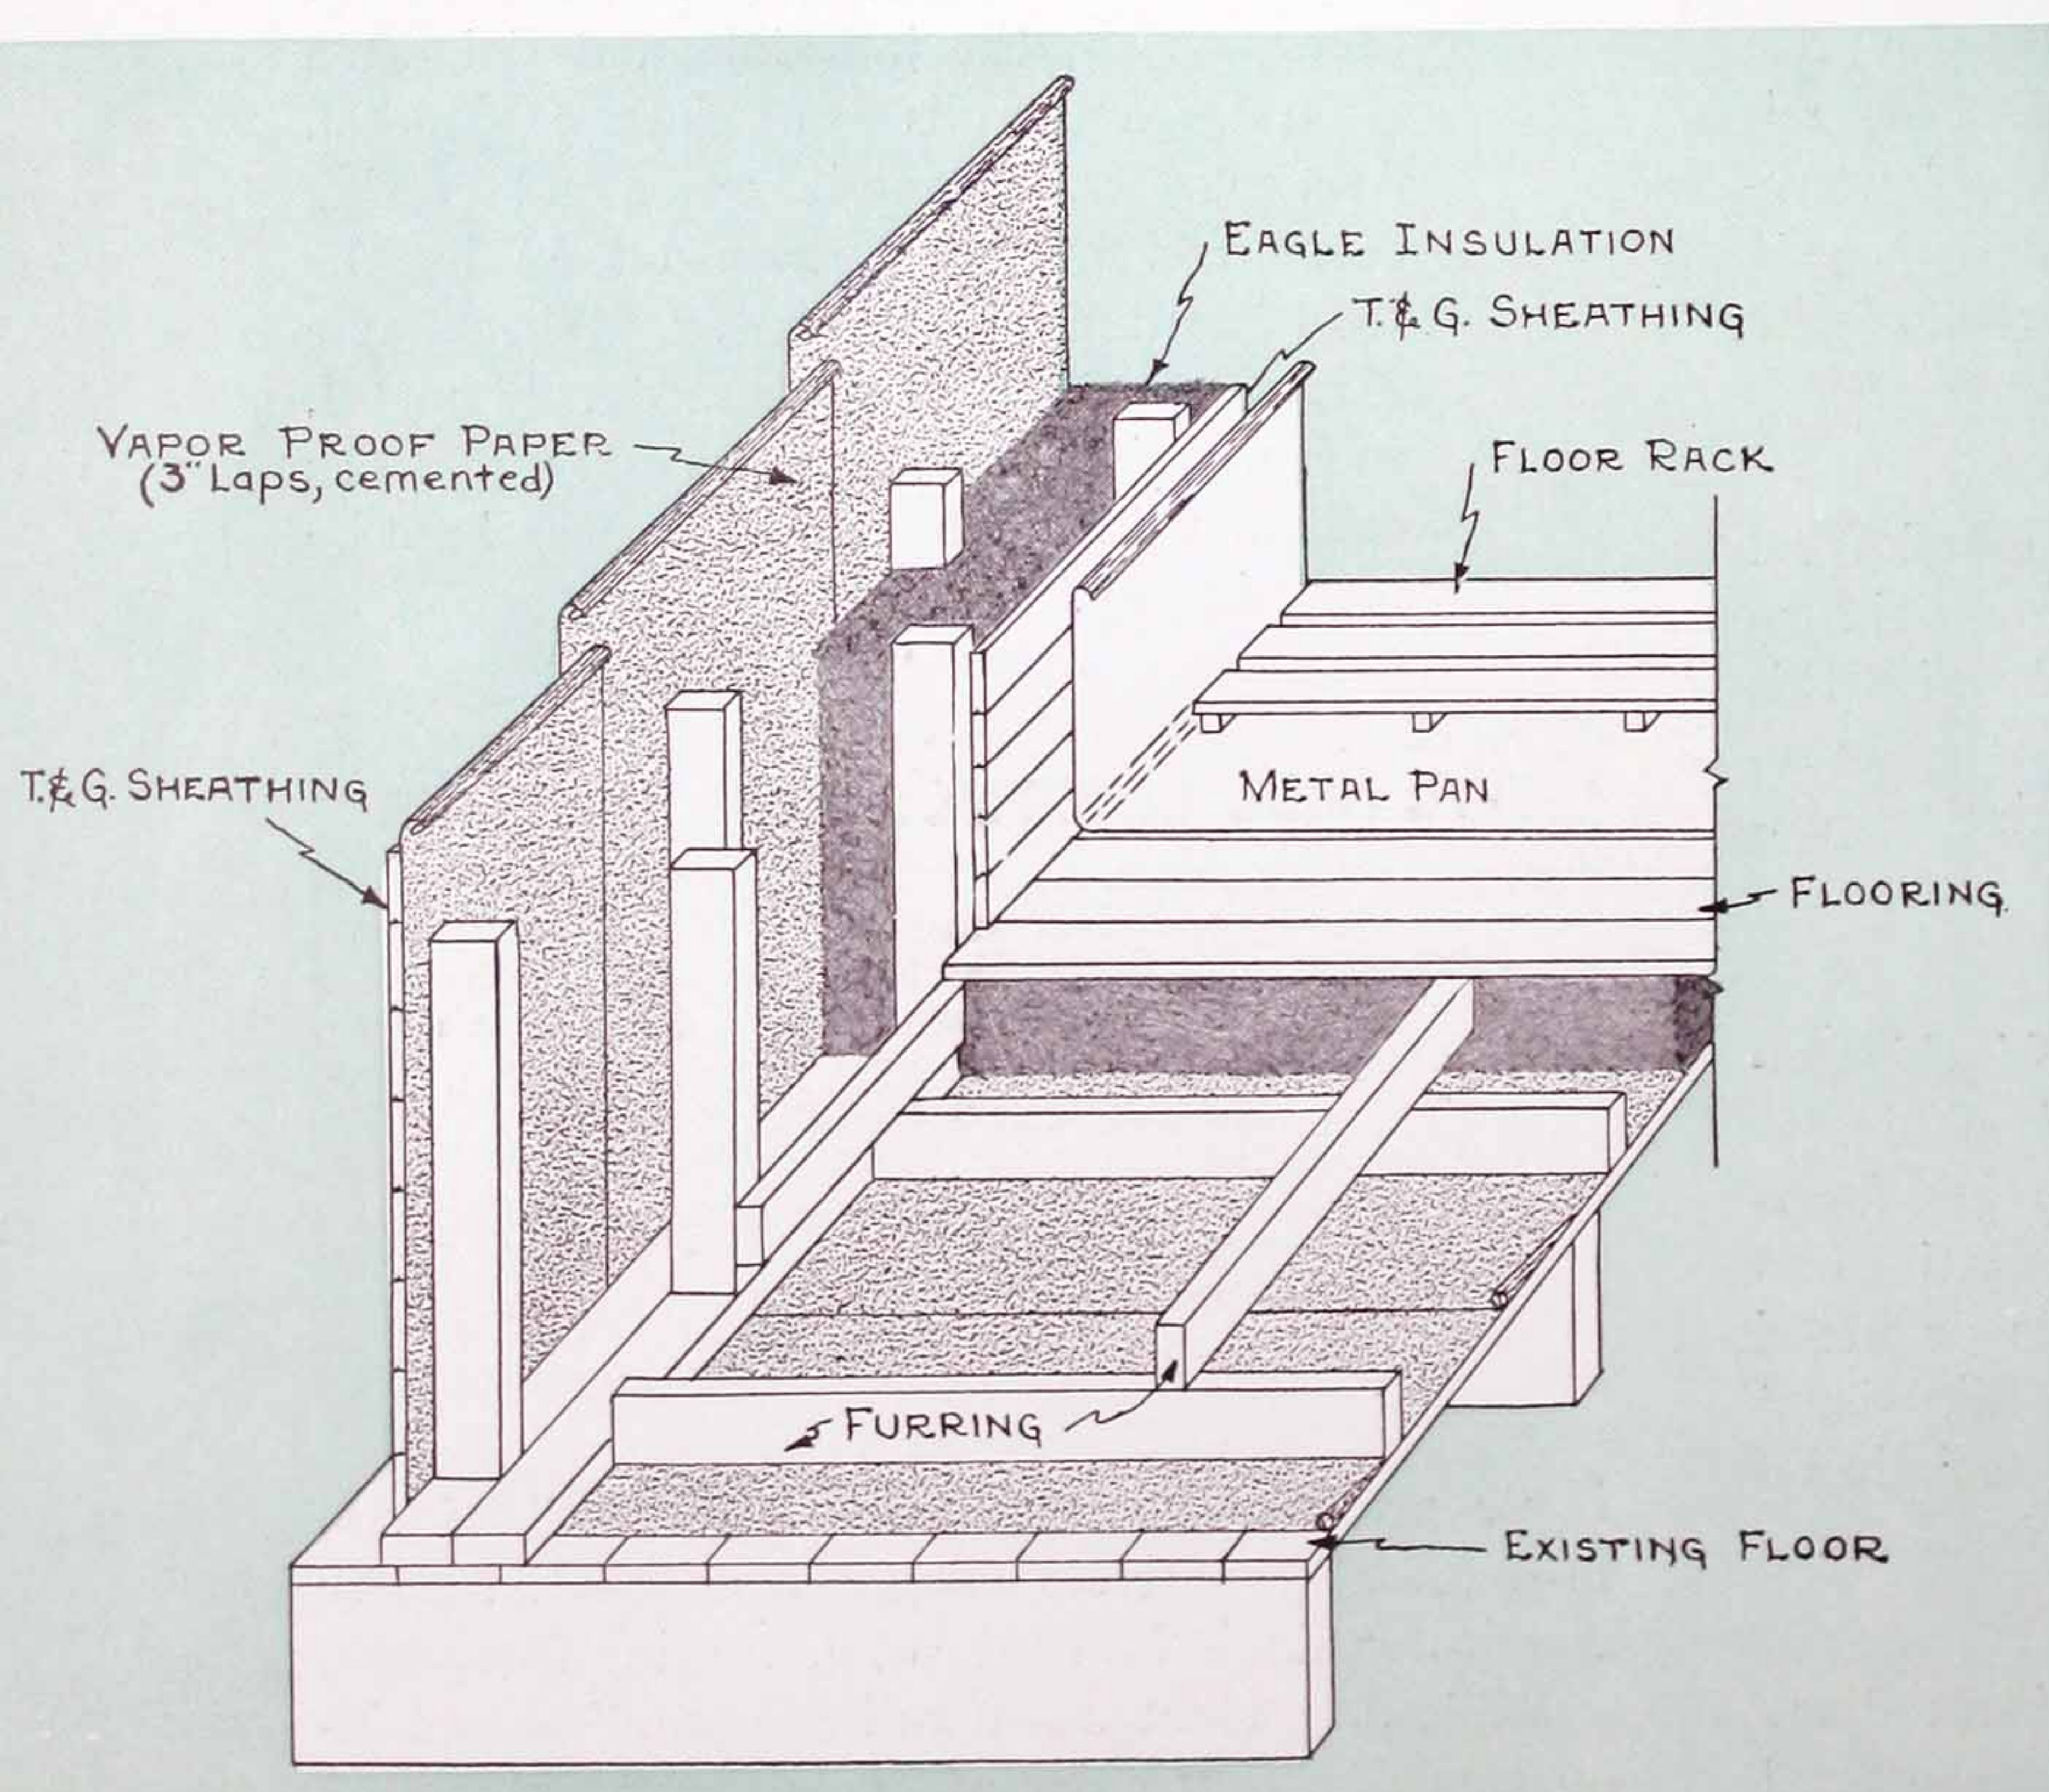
Drawing shows use of vapor barrier on all frame construction.
